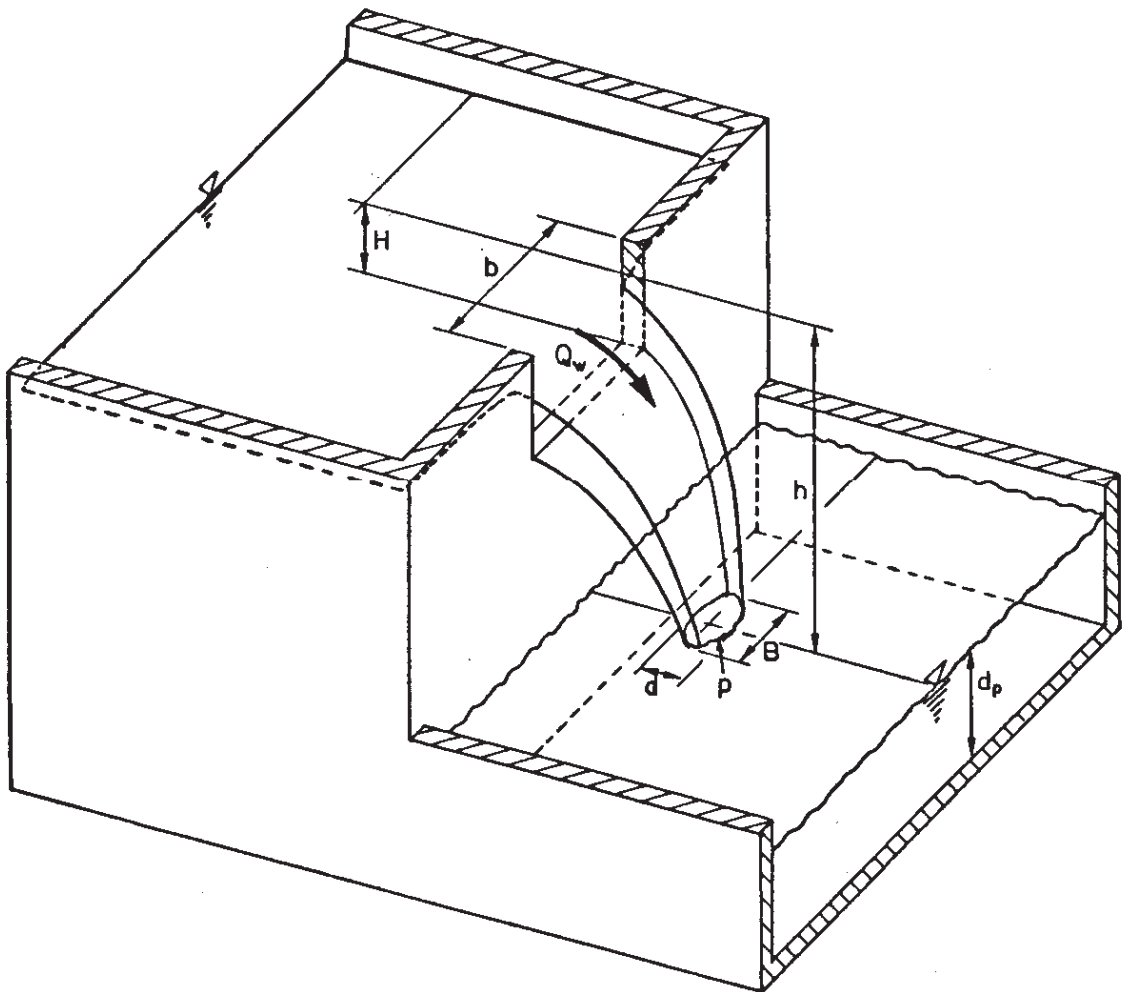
Definition sketch for plane nappes falling from a rectangular notch
